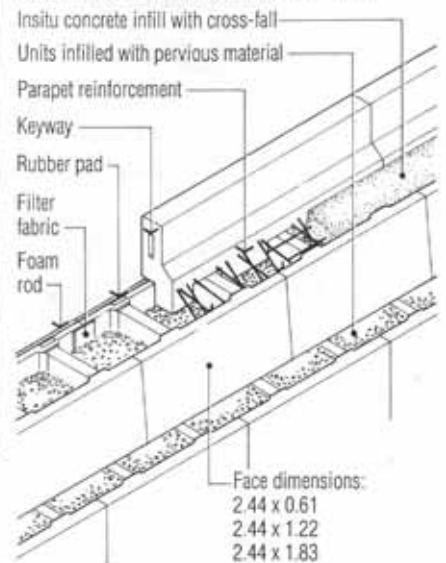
DOUBLEWALL ISOMETRIC VIEW
